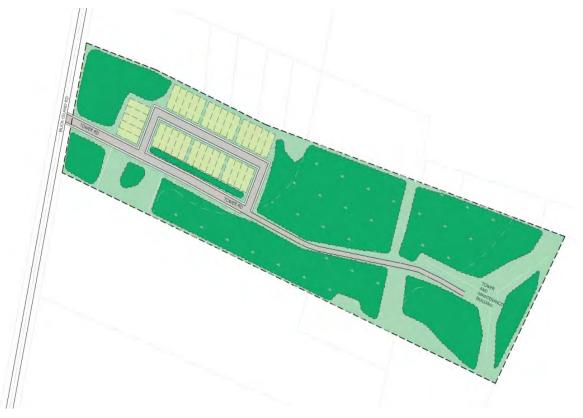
Conceptual infill residential on Tower Road shows 34 new lots tucked in an 18.3 acre property. The existing woods, wetlands, and significant tress are all preserved.
